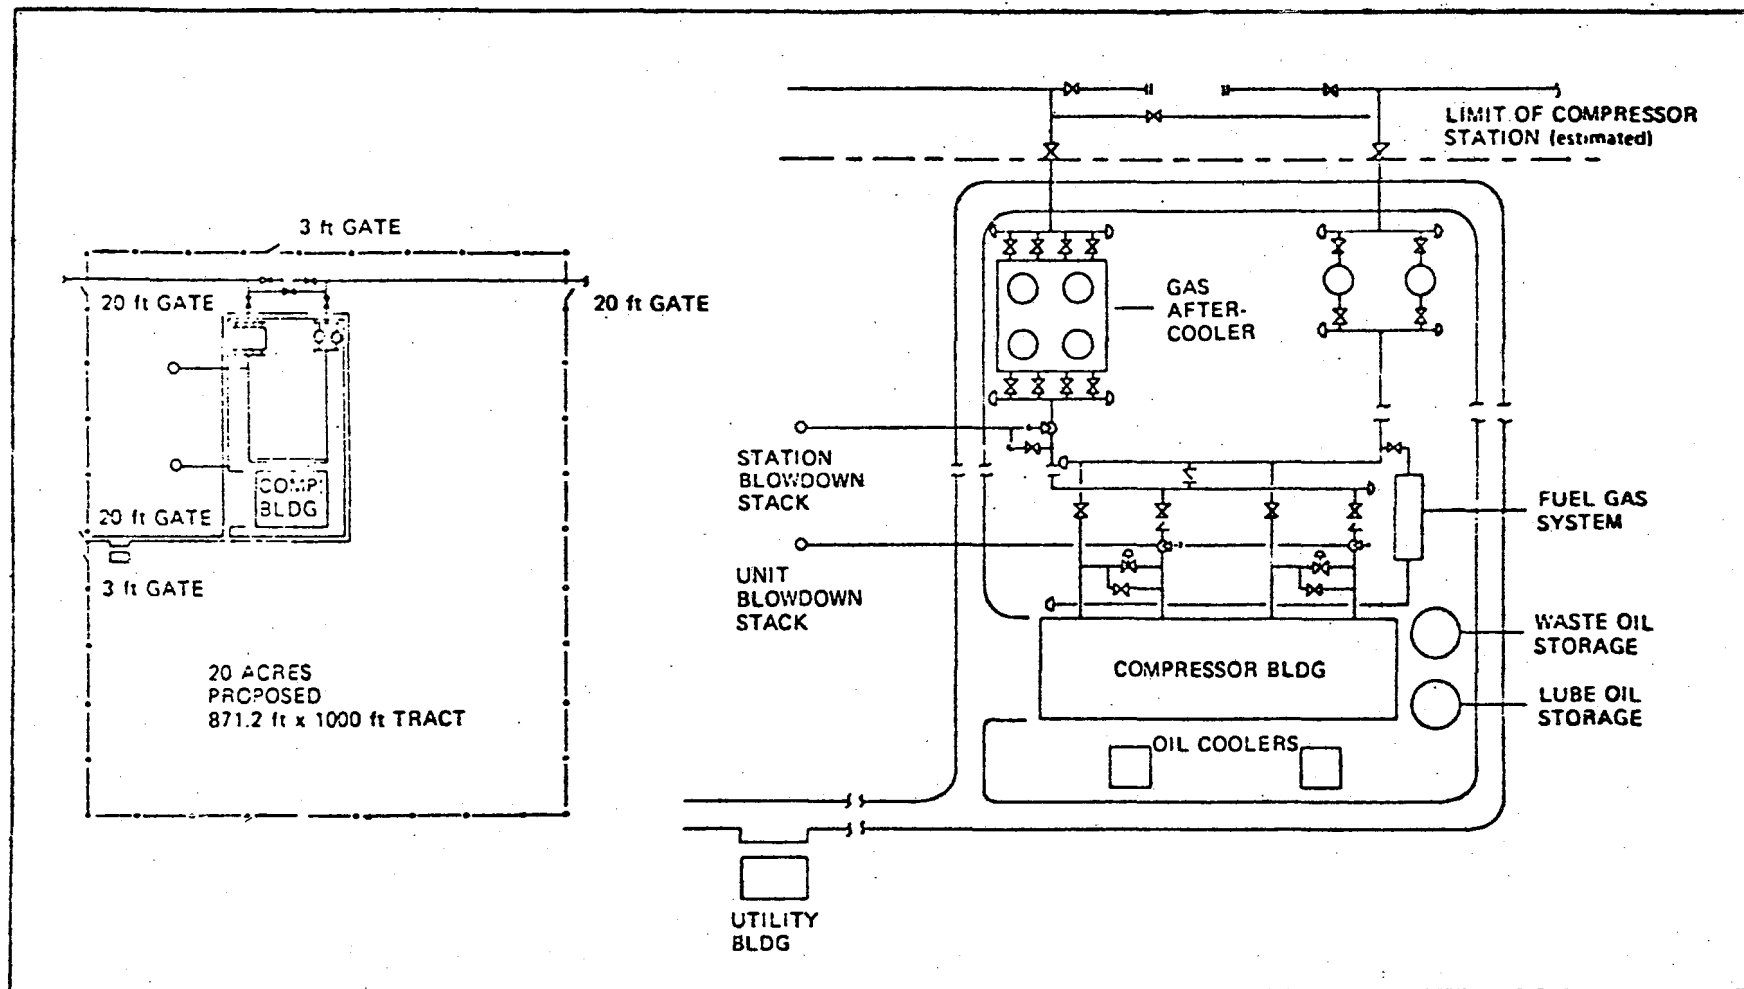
TYPICAL COMPRESSOR STATION, GENERAL PLAN
